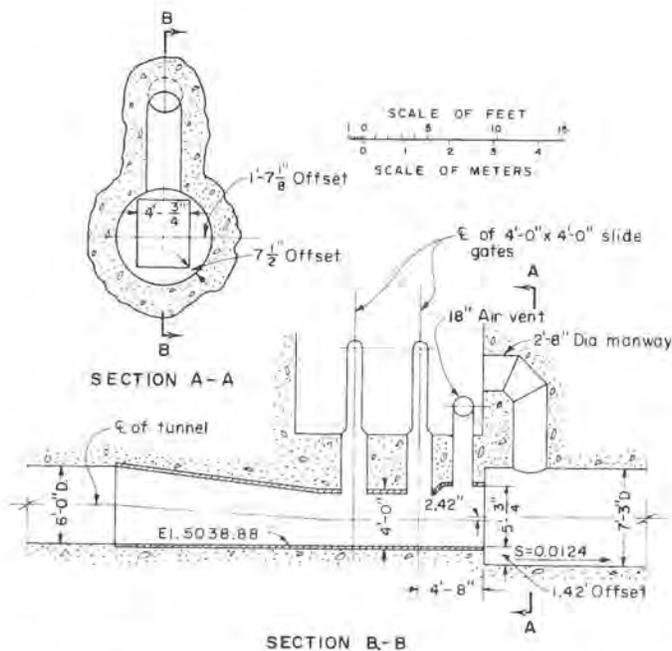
Teton Dam Recommended Auxiliary Outlet Works
